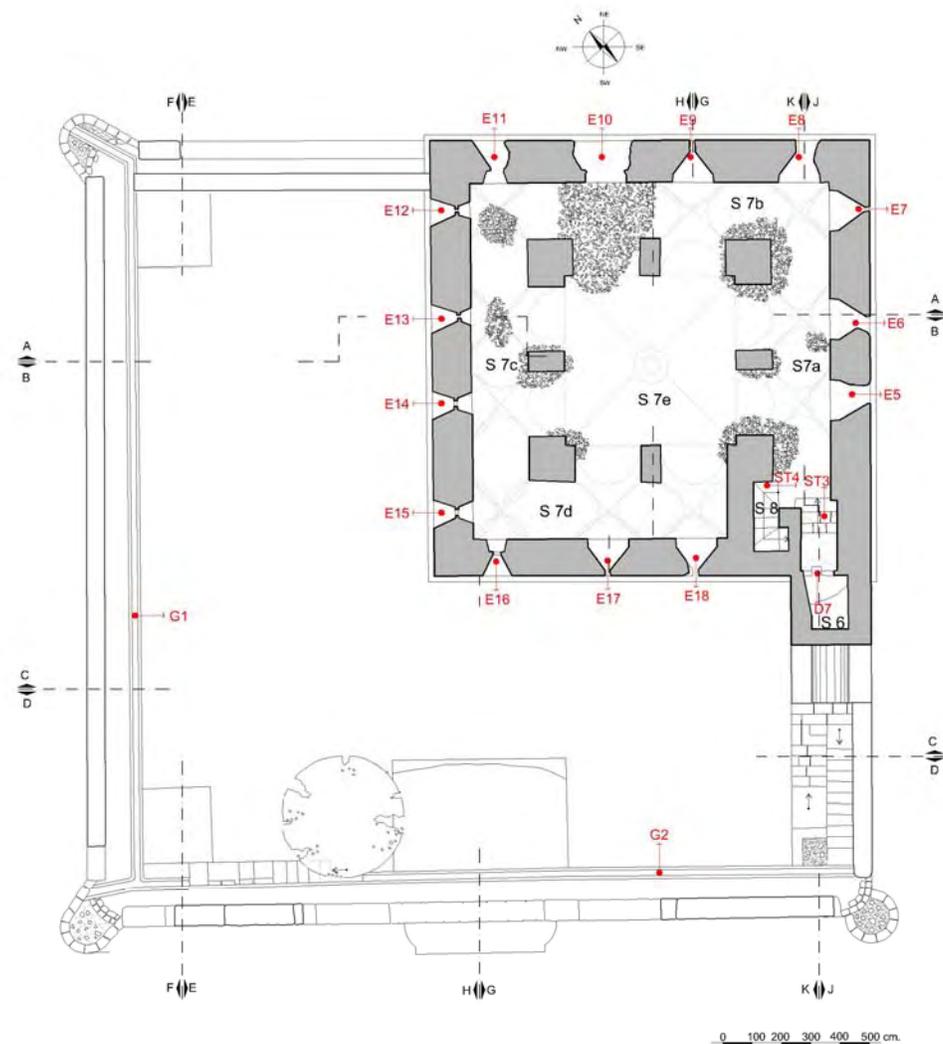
Key Plan- 1<sup>st</sup> Floor.
